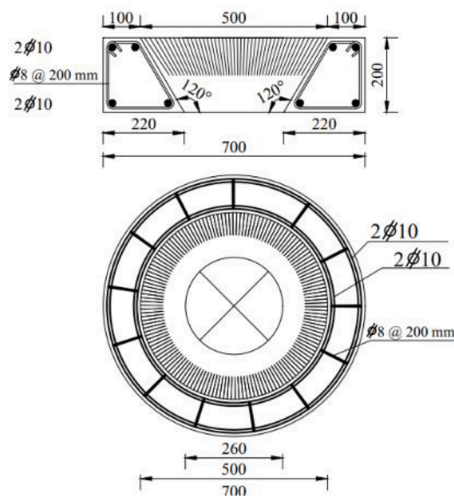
Geometric and reinforcement details of the beams (Dims; mm).
